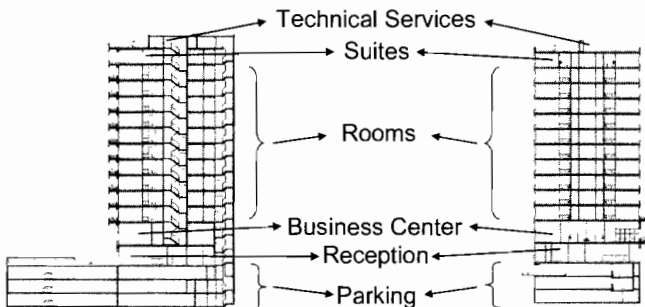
Section East-West and section South-North of Açores Lisboa Hotel.
